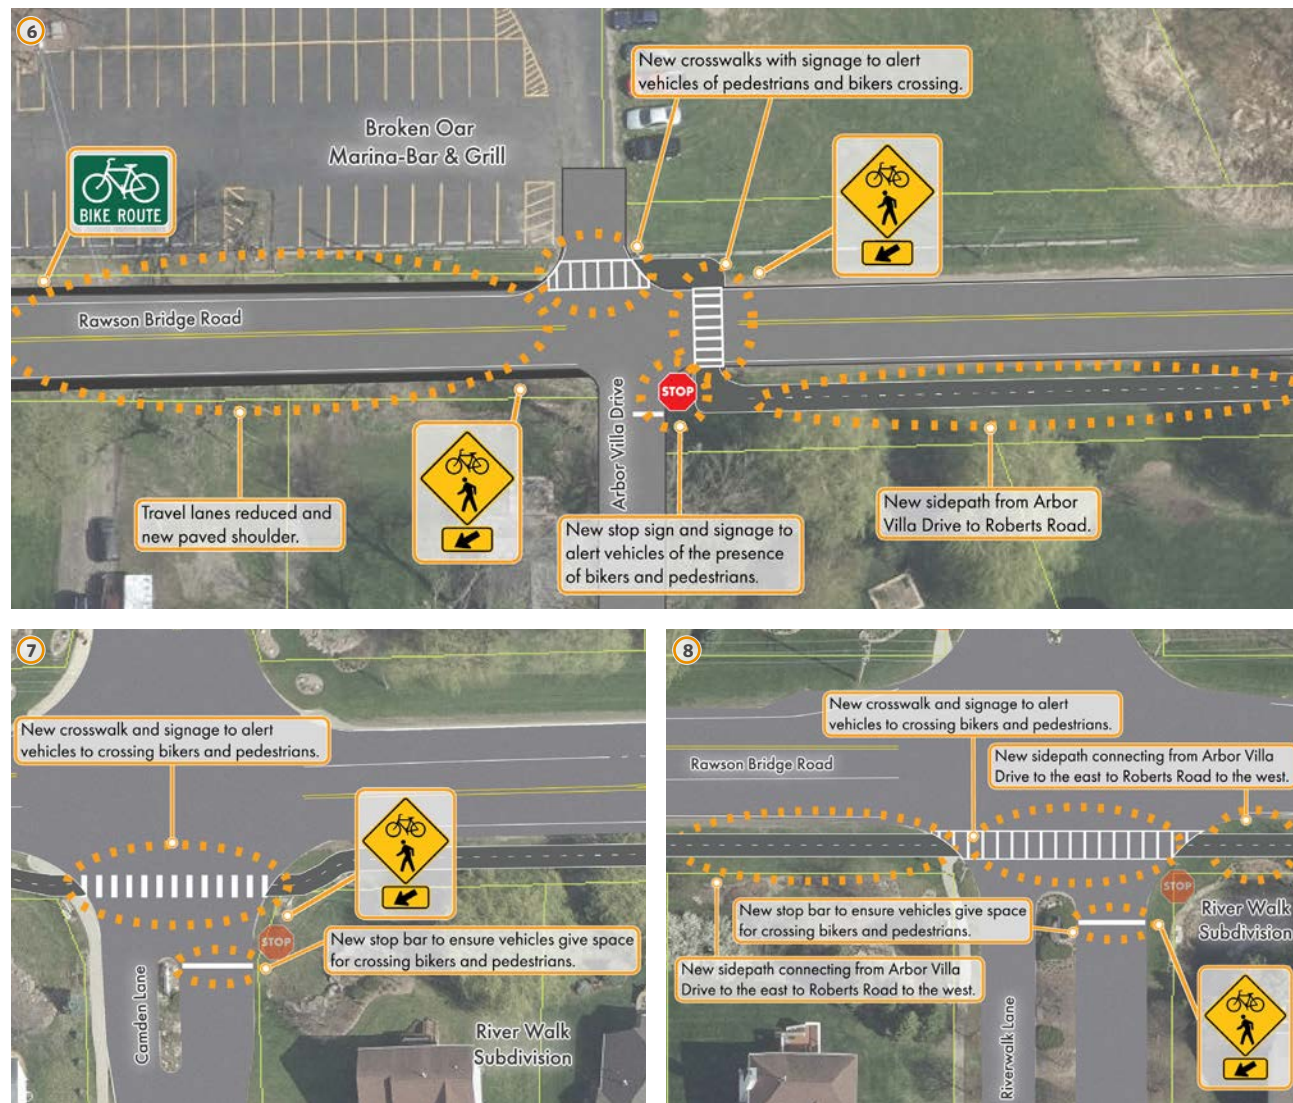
Improvement concept for Rawson Bridge Road/South Rawson Bridge Road intersection
